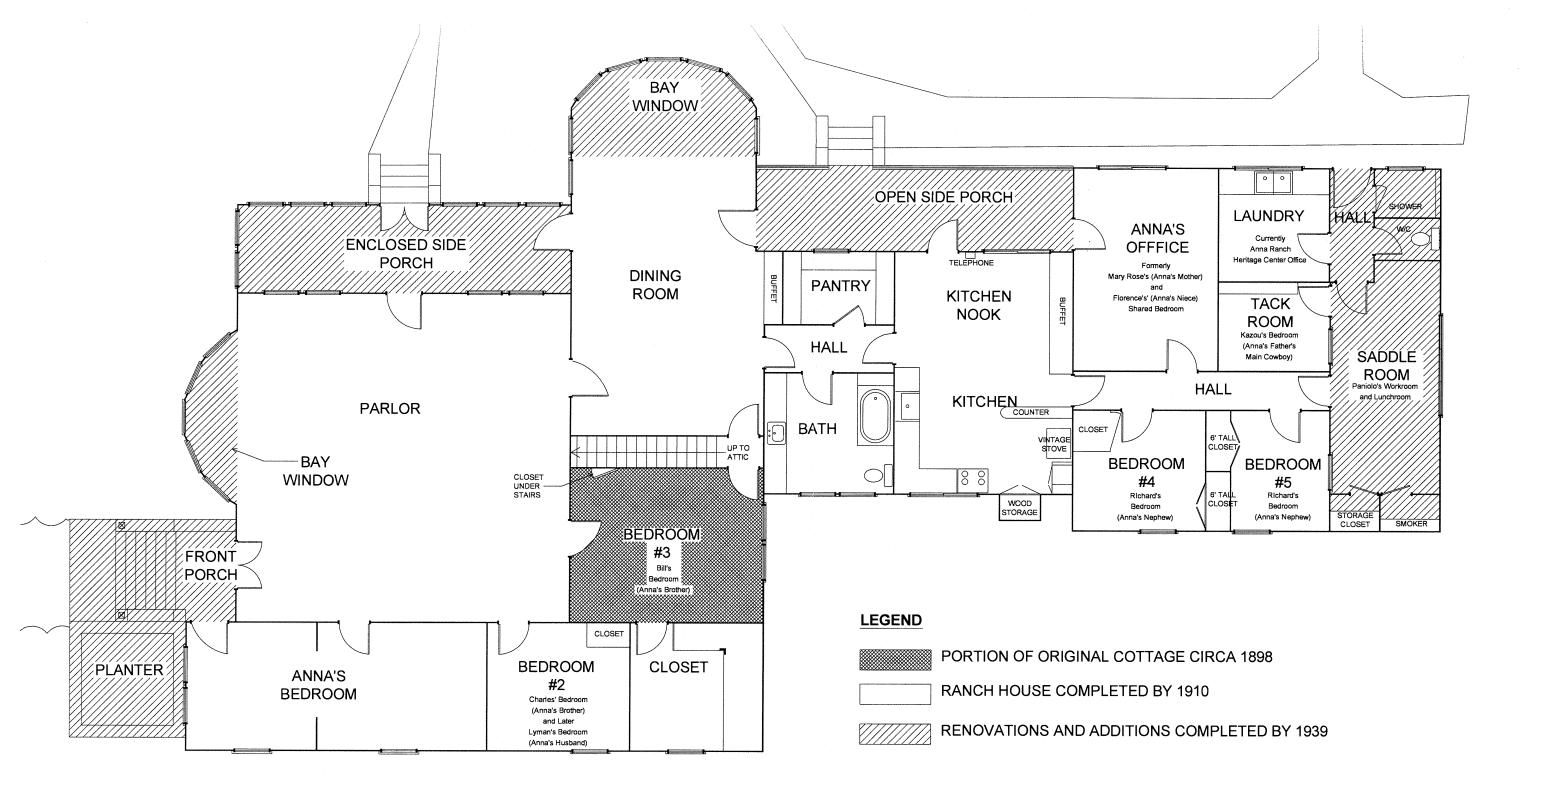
FIGURE D - BUILDING 1, RANCH HOUSE FLOOR PLAN
